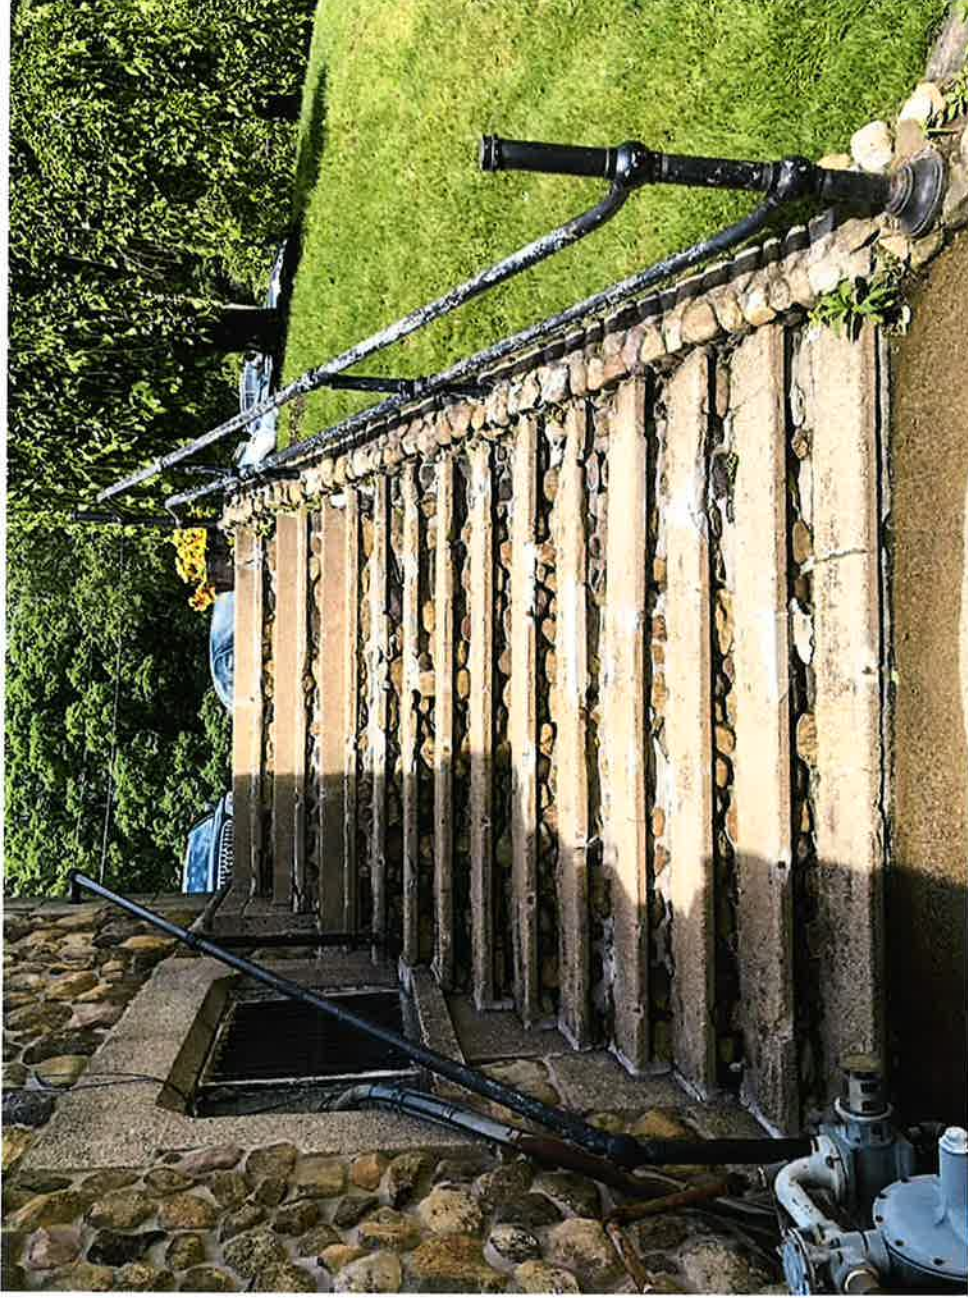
SOUTH SIDE ACCESS STAIRWAY
